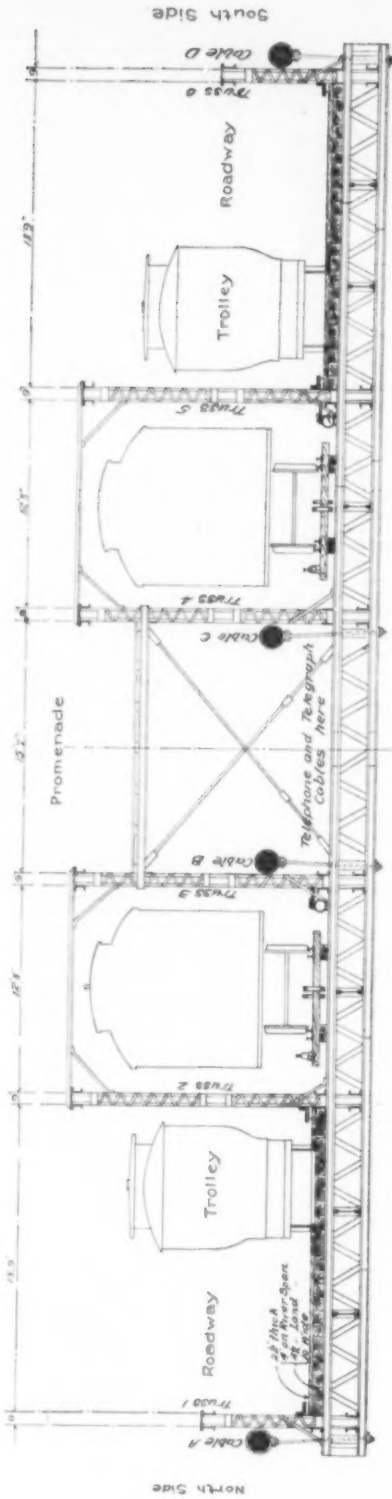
NEW YORK AND BROOKLYN BRIDGE—CROSS-SECTION NEAR CENTER OF MAIN SPAN.
